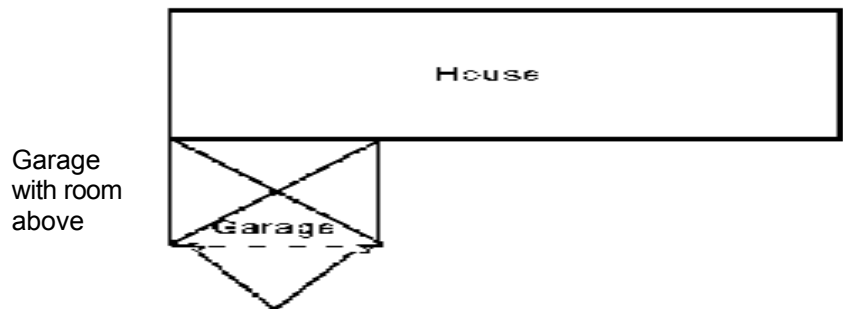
Additional bracing. Home configuration where there is no in-line wall. Additional bracing may be appropriate in this situation.
